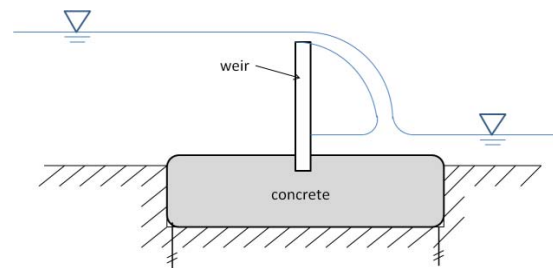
Grout bag filled with concrete until it adapts to the weir structure; flow beneath weir stopped;
